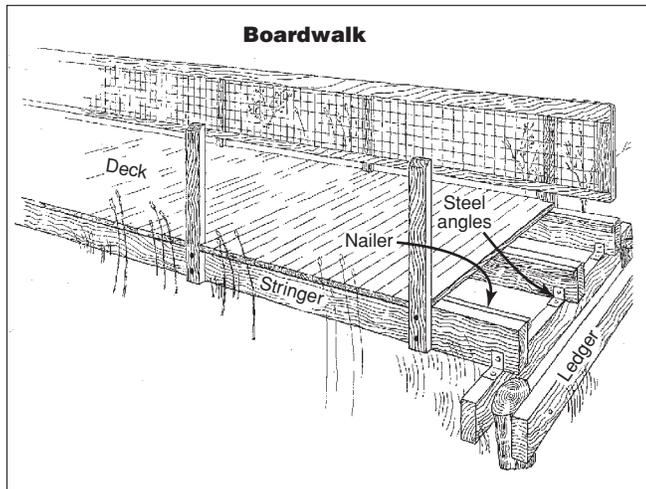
Details of boardwalk construction. Large stringers and ledgers connected with steel angles and nailers help increase the life of the stringers.
